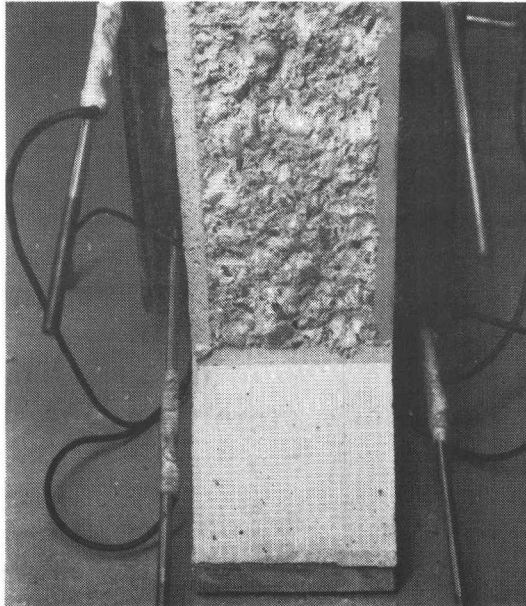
Crack face of a specimen tested with external restraint bars
